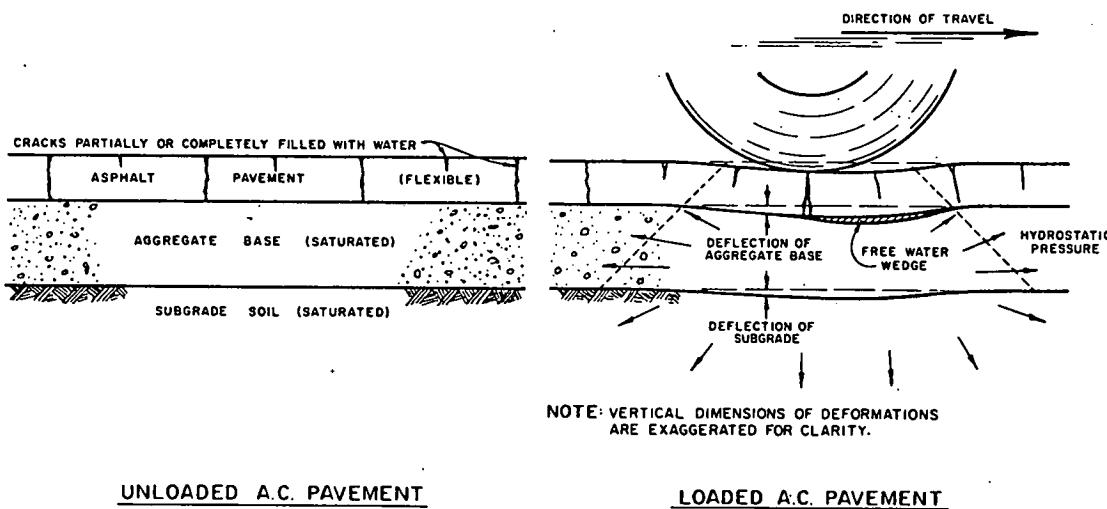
Action of free water in AC pavement structural sections under dynamic loading (10).
